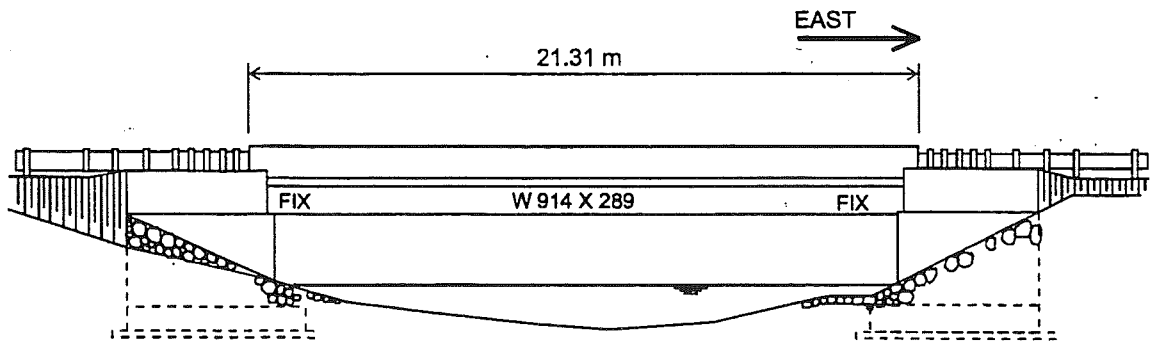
Elevation of Bridge M46/PR (B01-29041).
